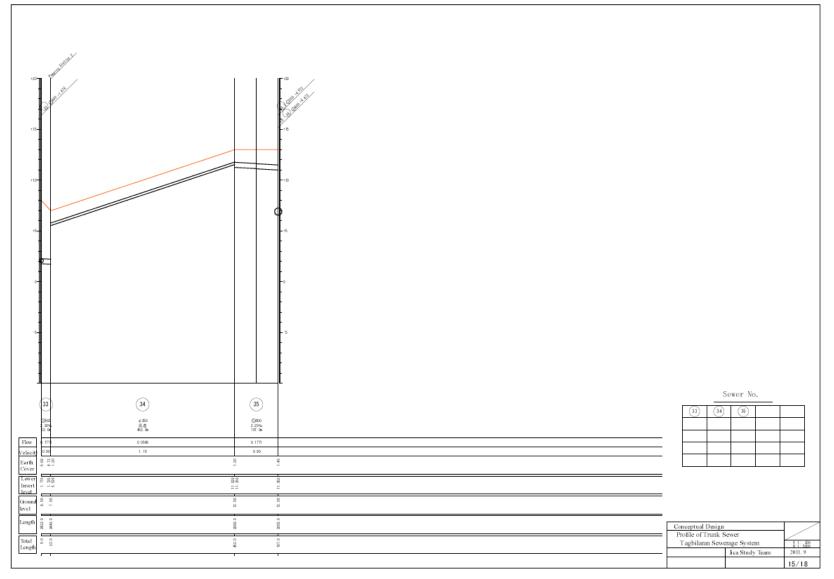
Profile of Trunk Sewer (Tagbilaran Sewerage System)
